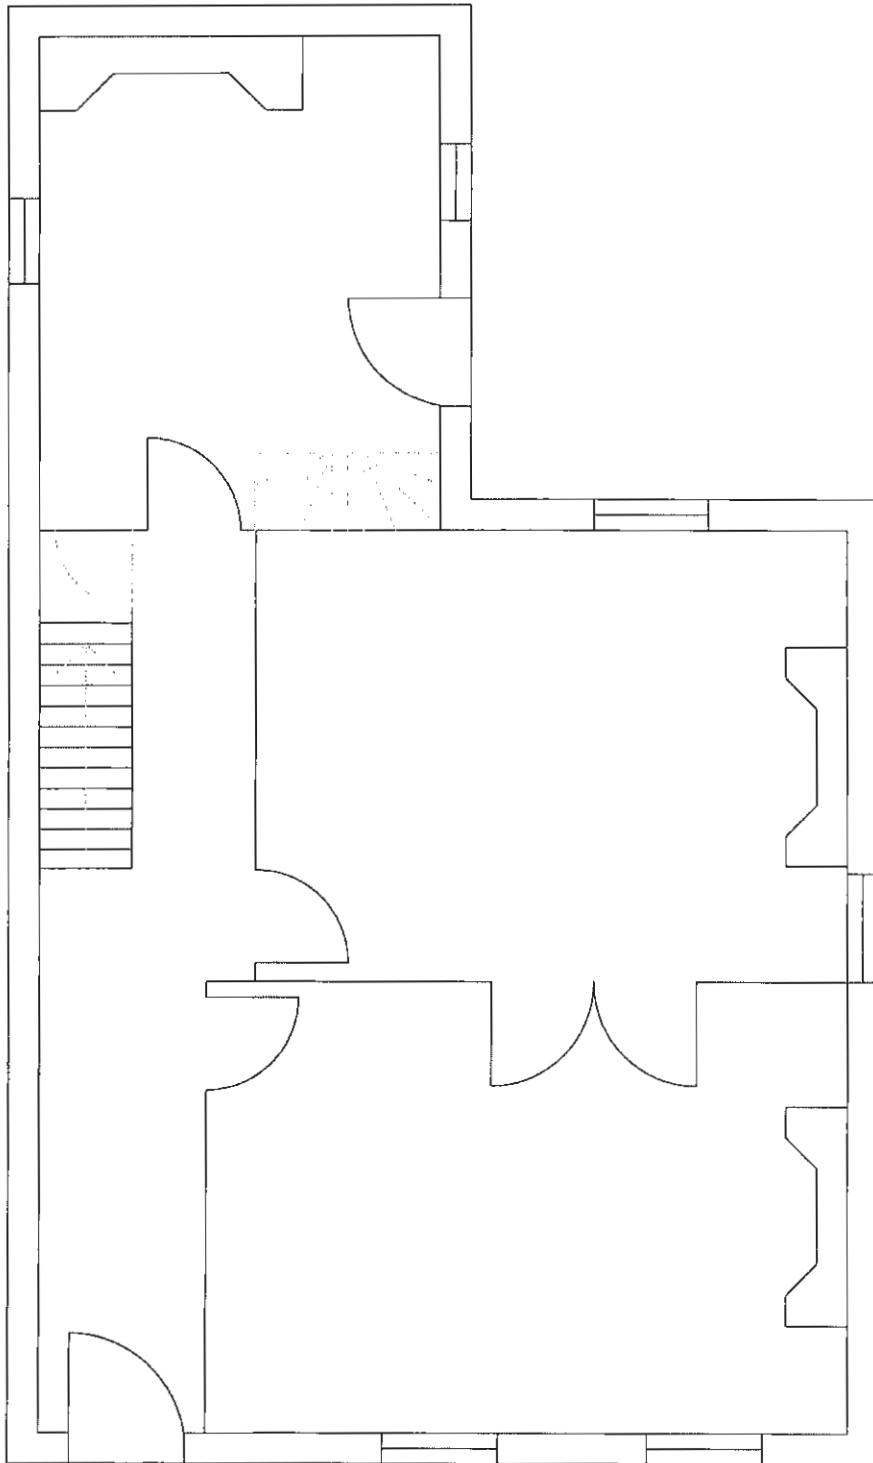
Floor plan of first floor as it looked in 1829 when Alexander Darragh bought the house.
